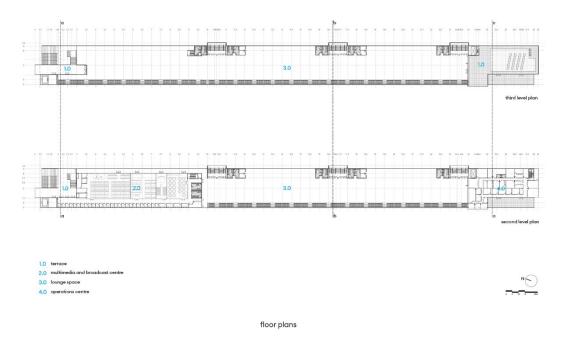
Second and Third Floor Plan of Canadian Grand Prix Paddock (Source: FABG Architectes)
